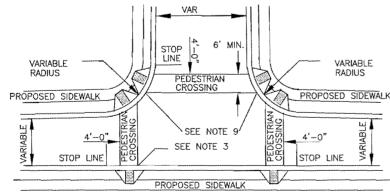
DETAIL SHOWING TYPICAL LOCATION OF WHEELCHAIR RAMPS, PEDESTRIAN CROSSWALKS AND STOP BARS
